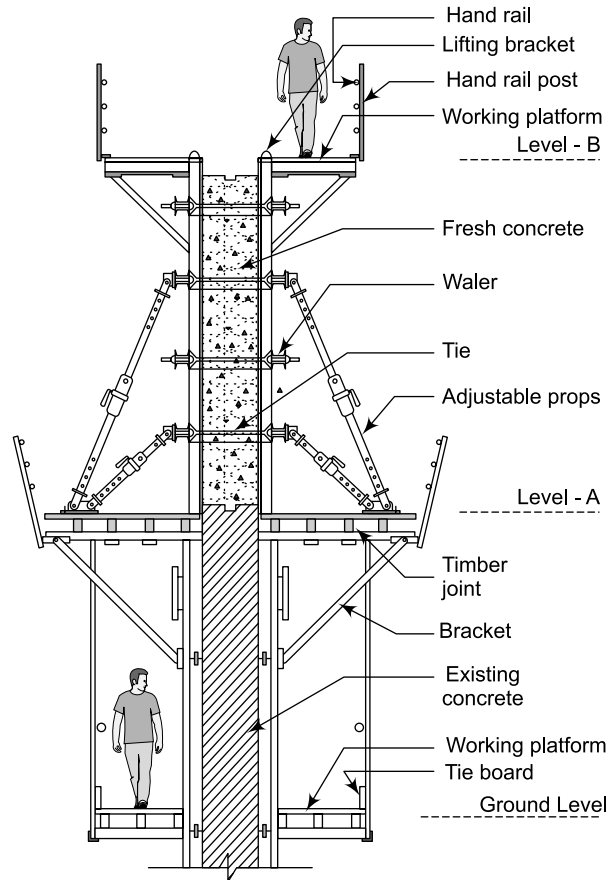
(a) Climbing Formwork Arrangement for Second Pour.
